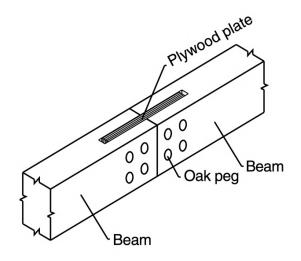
Beam-to-beam connection (Chang et all, 2010)
